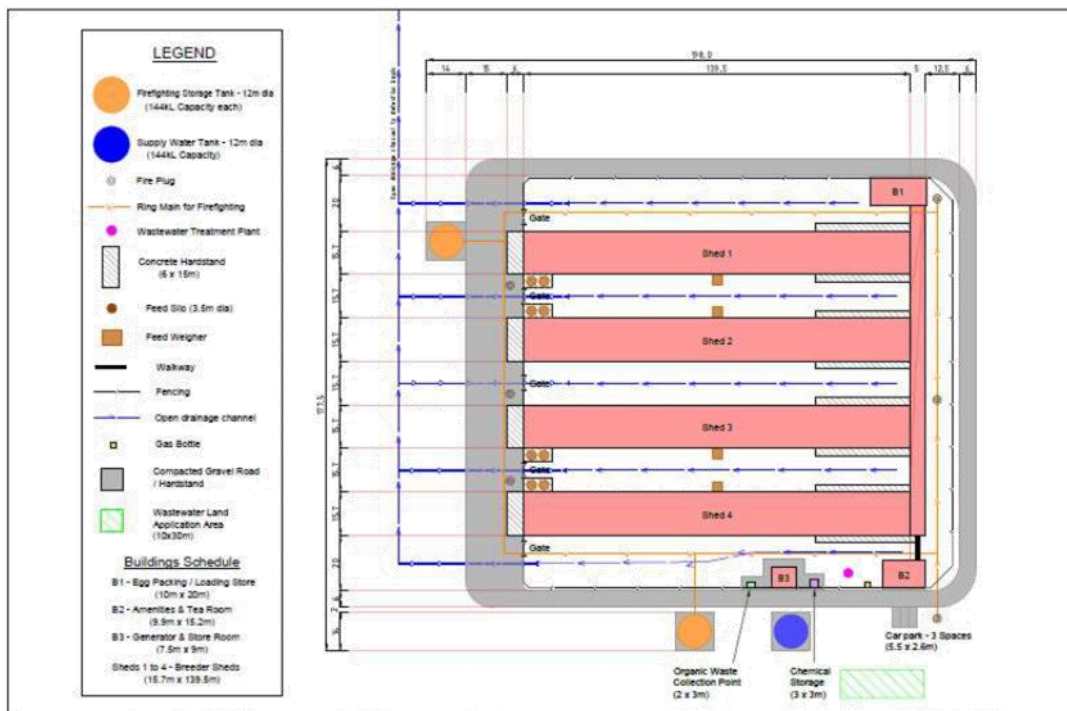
Breeder Shed Site Layout Plan (Source: Application Plans)
